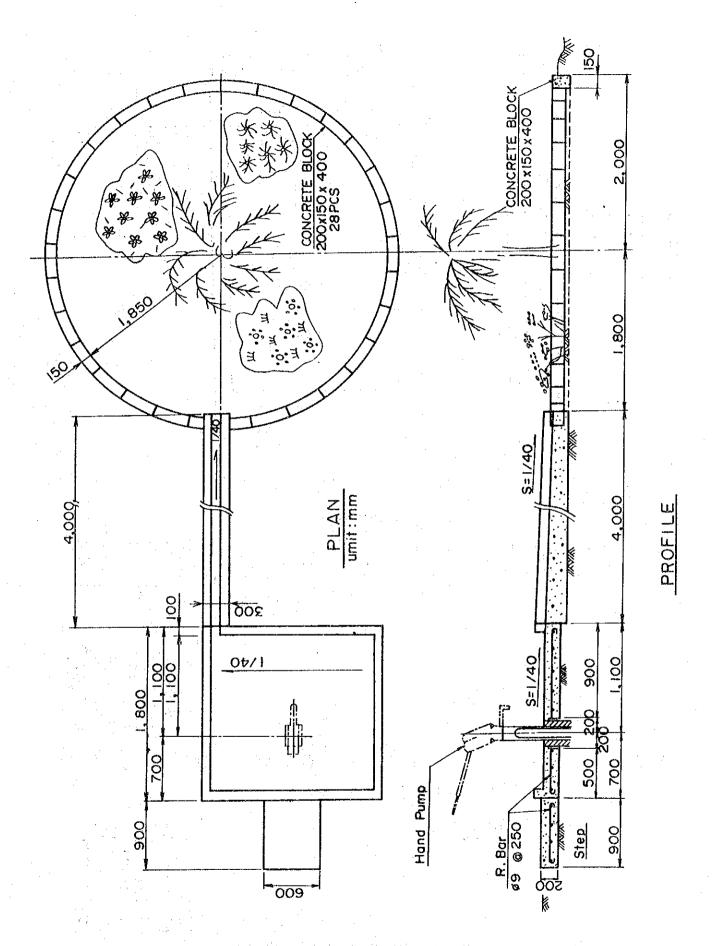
GENERAL PLAN FOR BOREHOLE FACILITY
